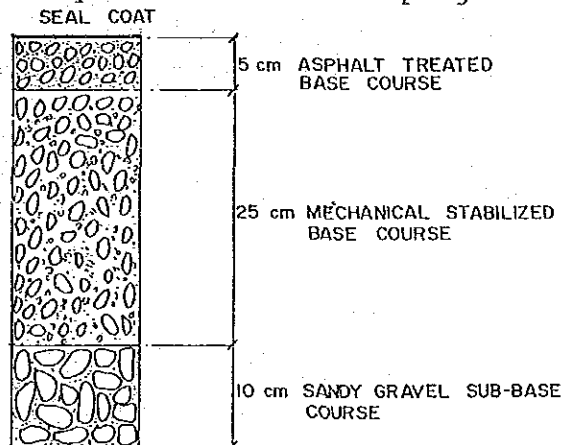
Typical Cross-section of Hard Shoulder
